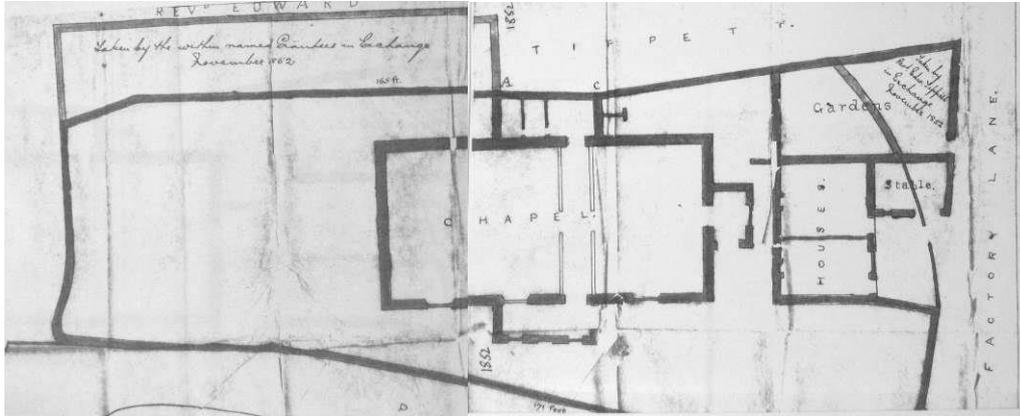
Site plan of 1852 showing exchange of land with Rev. Edward Tippett ('Truro Meeting House, log book of premises', 2010)
